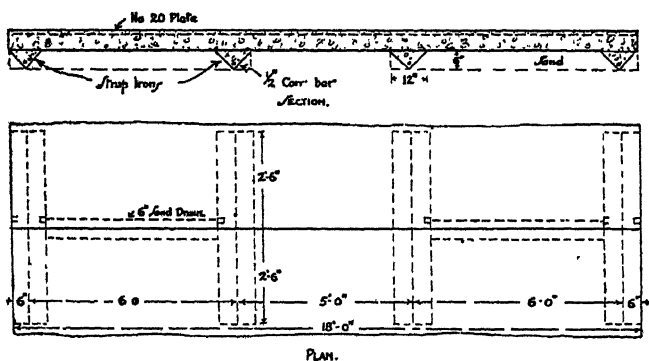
METHOD OF STRENGTHENING TRANSVERSE JOINTS BY V-SHAPED R.C. BEAMS.
